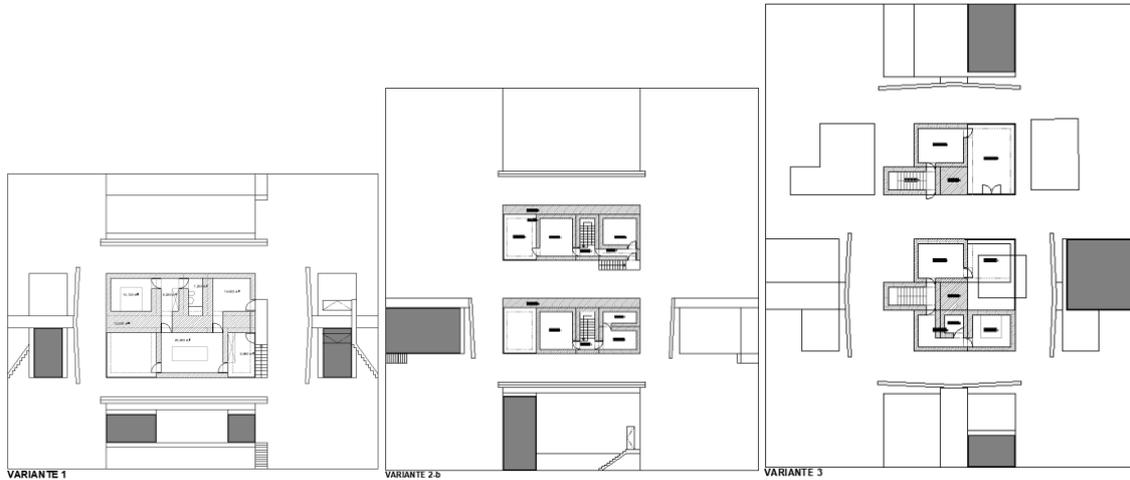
3 different housing plan were evaluated. (1) Single floor suspended with concrete blade (94 m²). (2) Two suspended floors with pillars (94 m²). (3) Two floors compact (125 m²).
